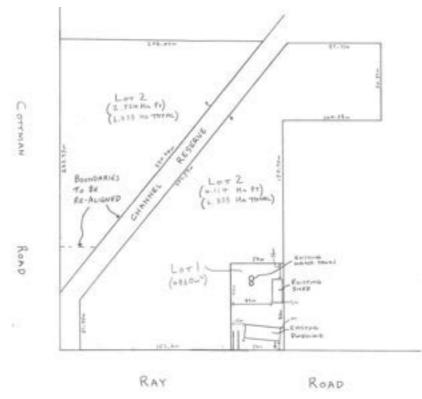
Proposed plan of subdivision submitted with the application as amended during the application process
